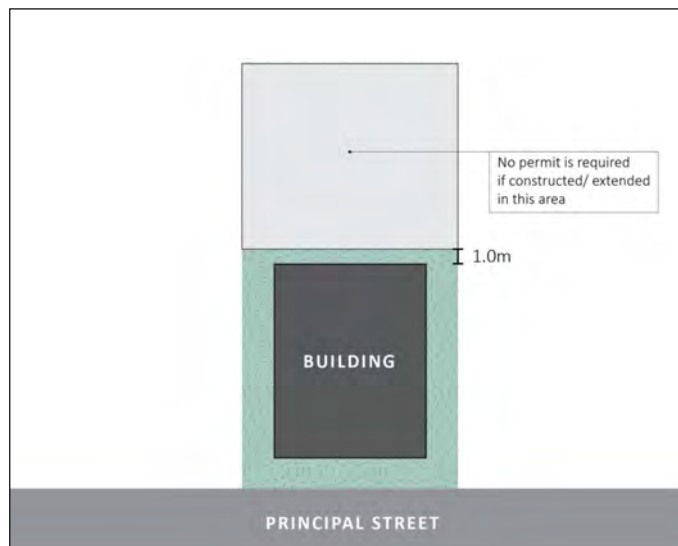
Construction or extension of an outbuilding is exempt if located in this area
